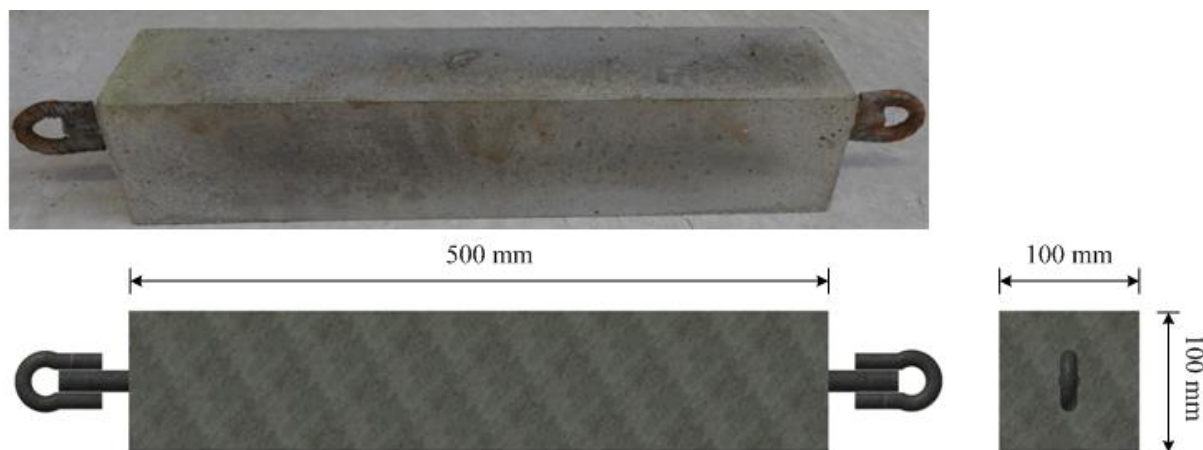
Dimensions of uni-axial tensile specimen with end anchors
